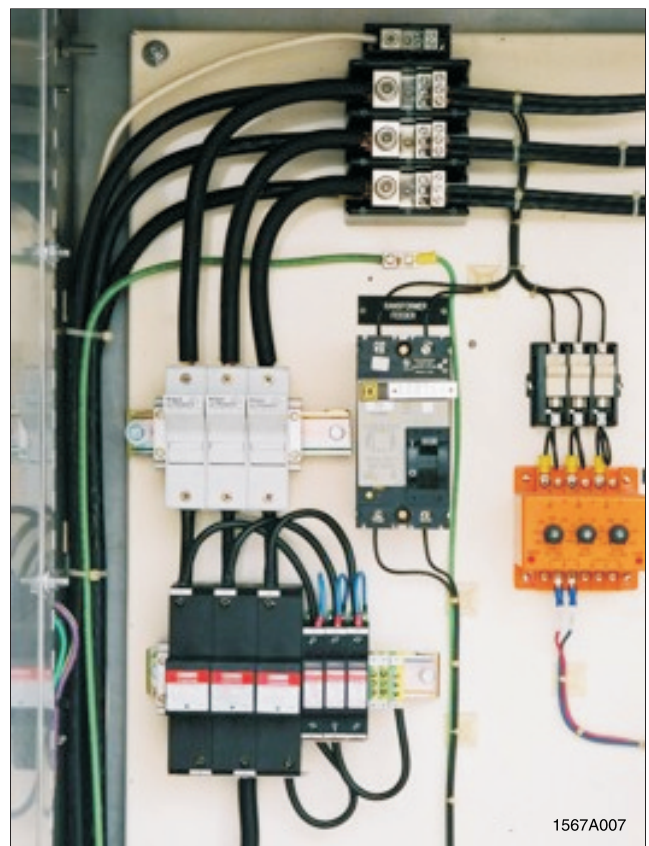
COMBOTRAB Rail Assembly installed in user panel
